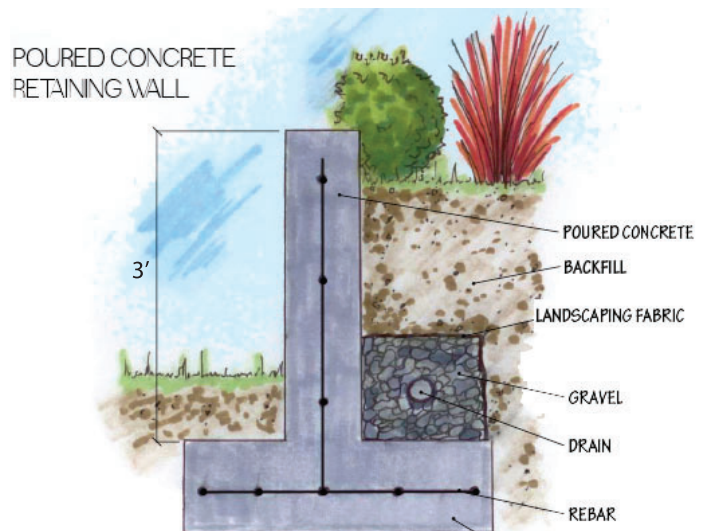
An illustrative section of a poured concrete retaining wall. The wall must be parged to be considered under the ACoA process.
